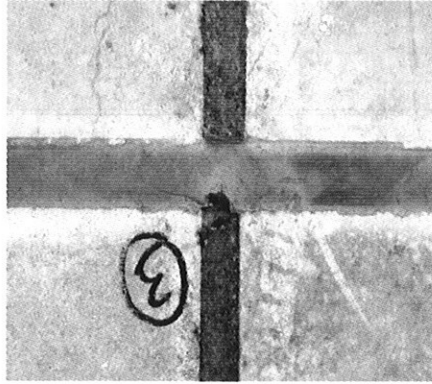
Expansion joints, Roof of coffin crematorium building (Sample No.B/261/06/3)
